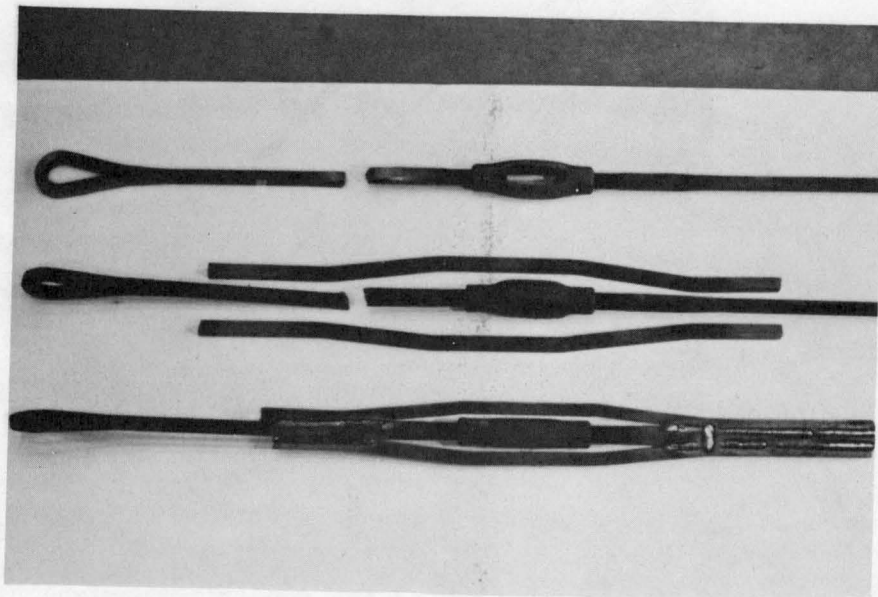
Photograph showing the repair for a fracture in the forging at a turnbuckle.
